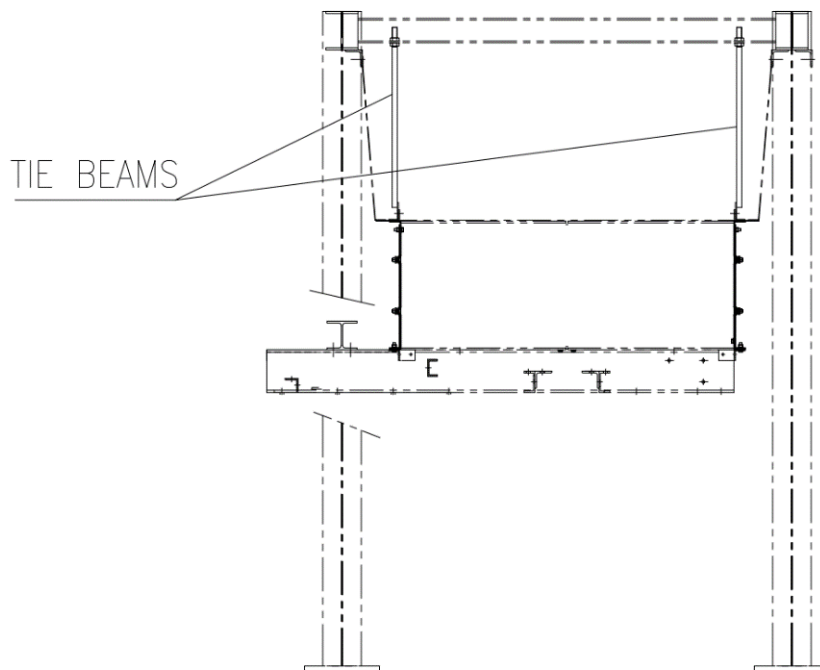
Connecting Support Mechanism + Fan Ring + Plenum to Structure and Leveling by Tie Beams
